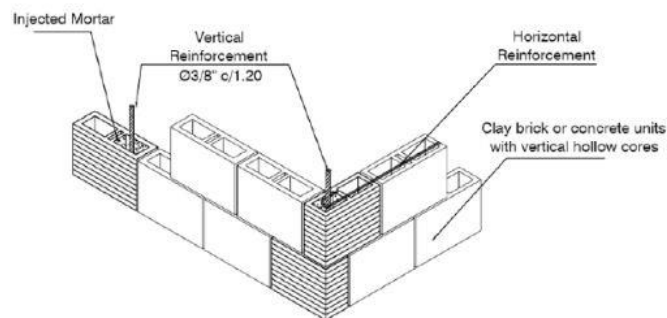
Details of the assembled reinforced masonry wall, (Hackmayer et al. 2013)
